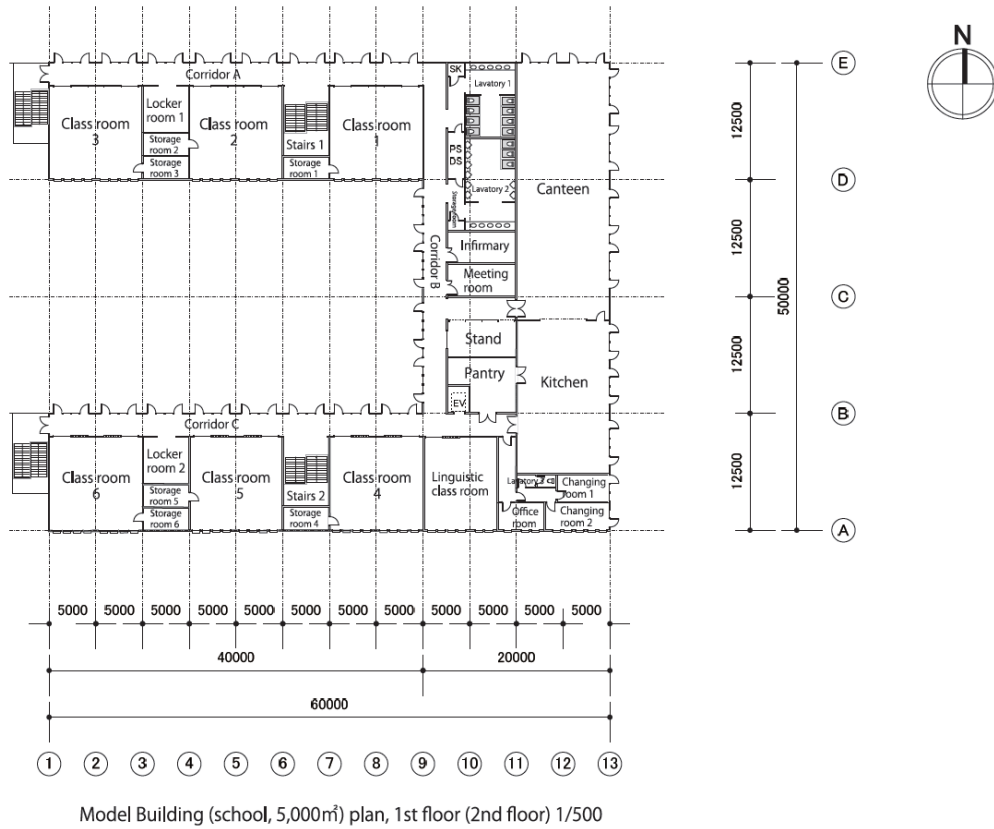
Model building (school, 5 000 m²) plan, first floor (second floor) 1/500
